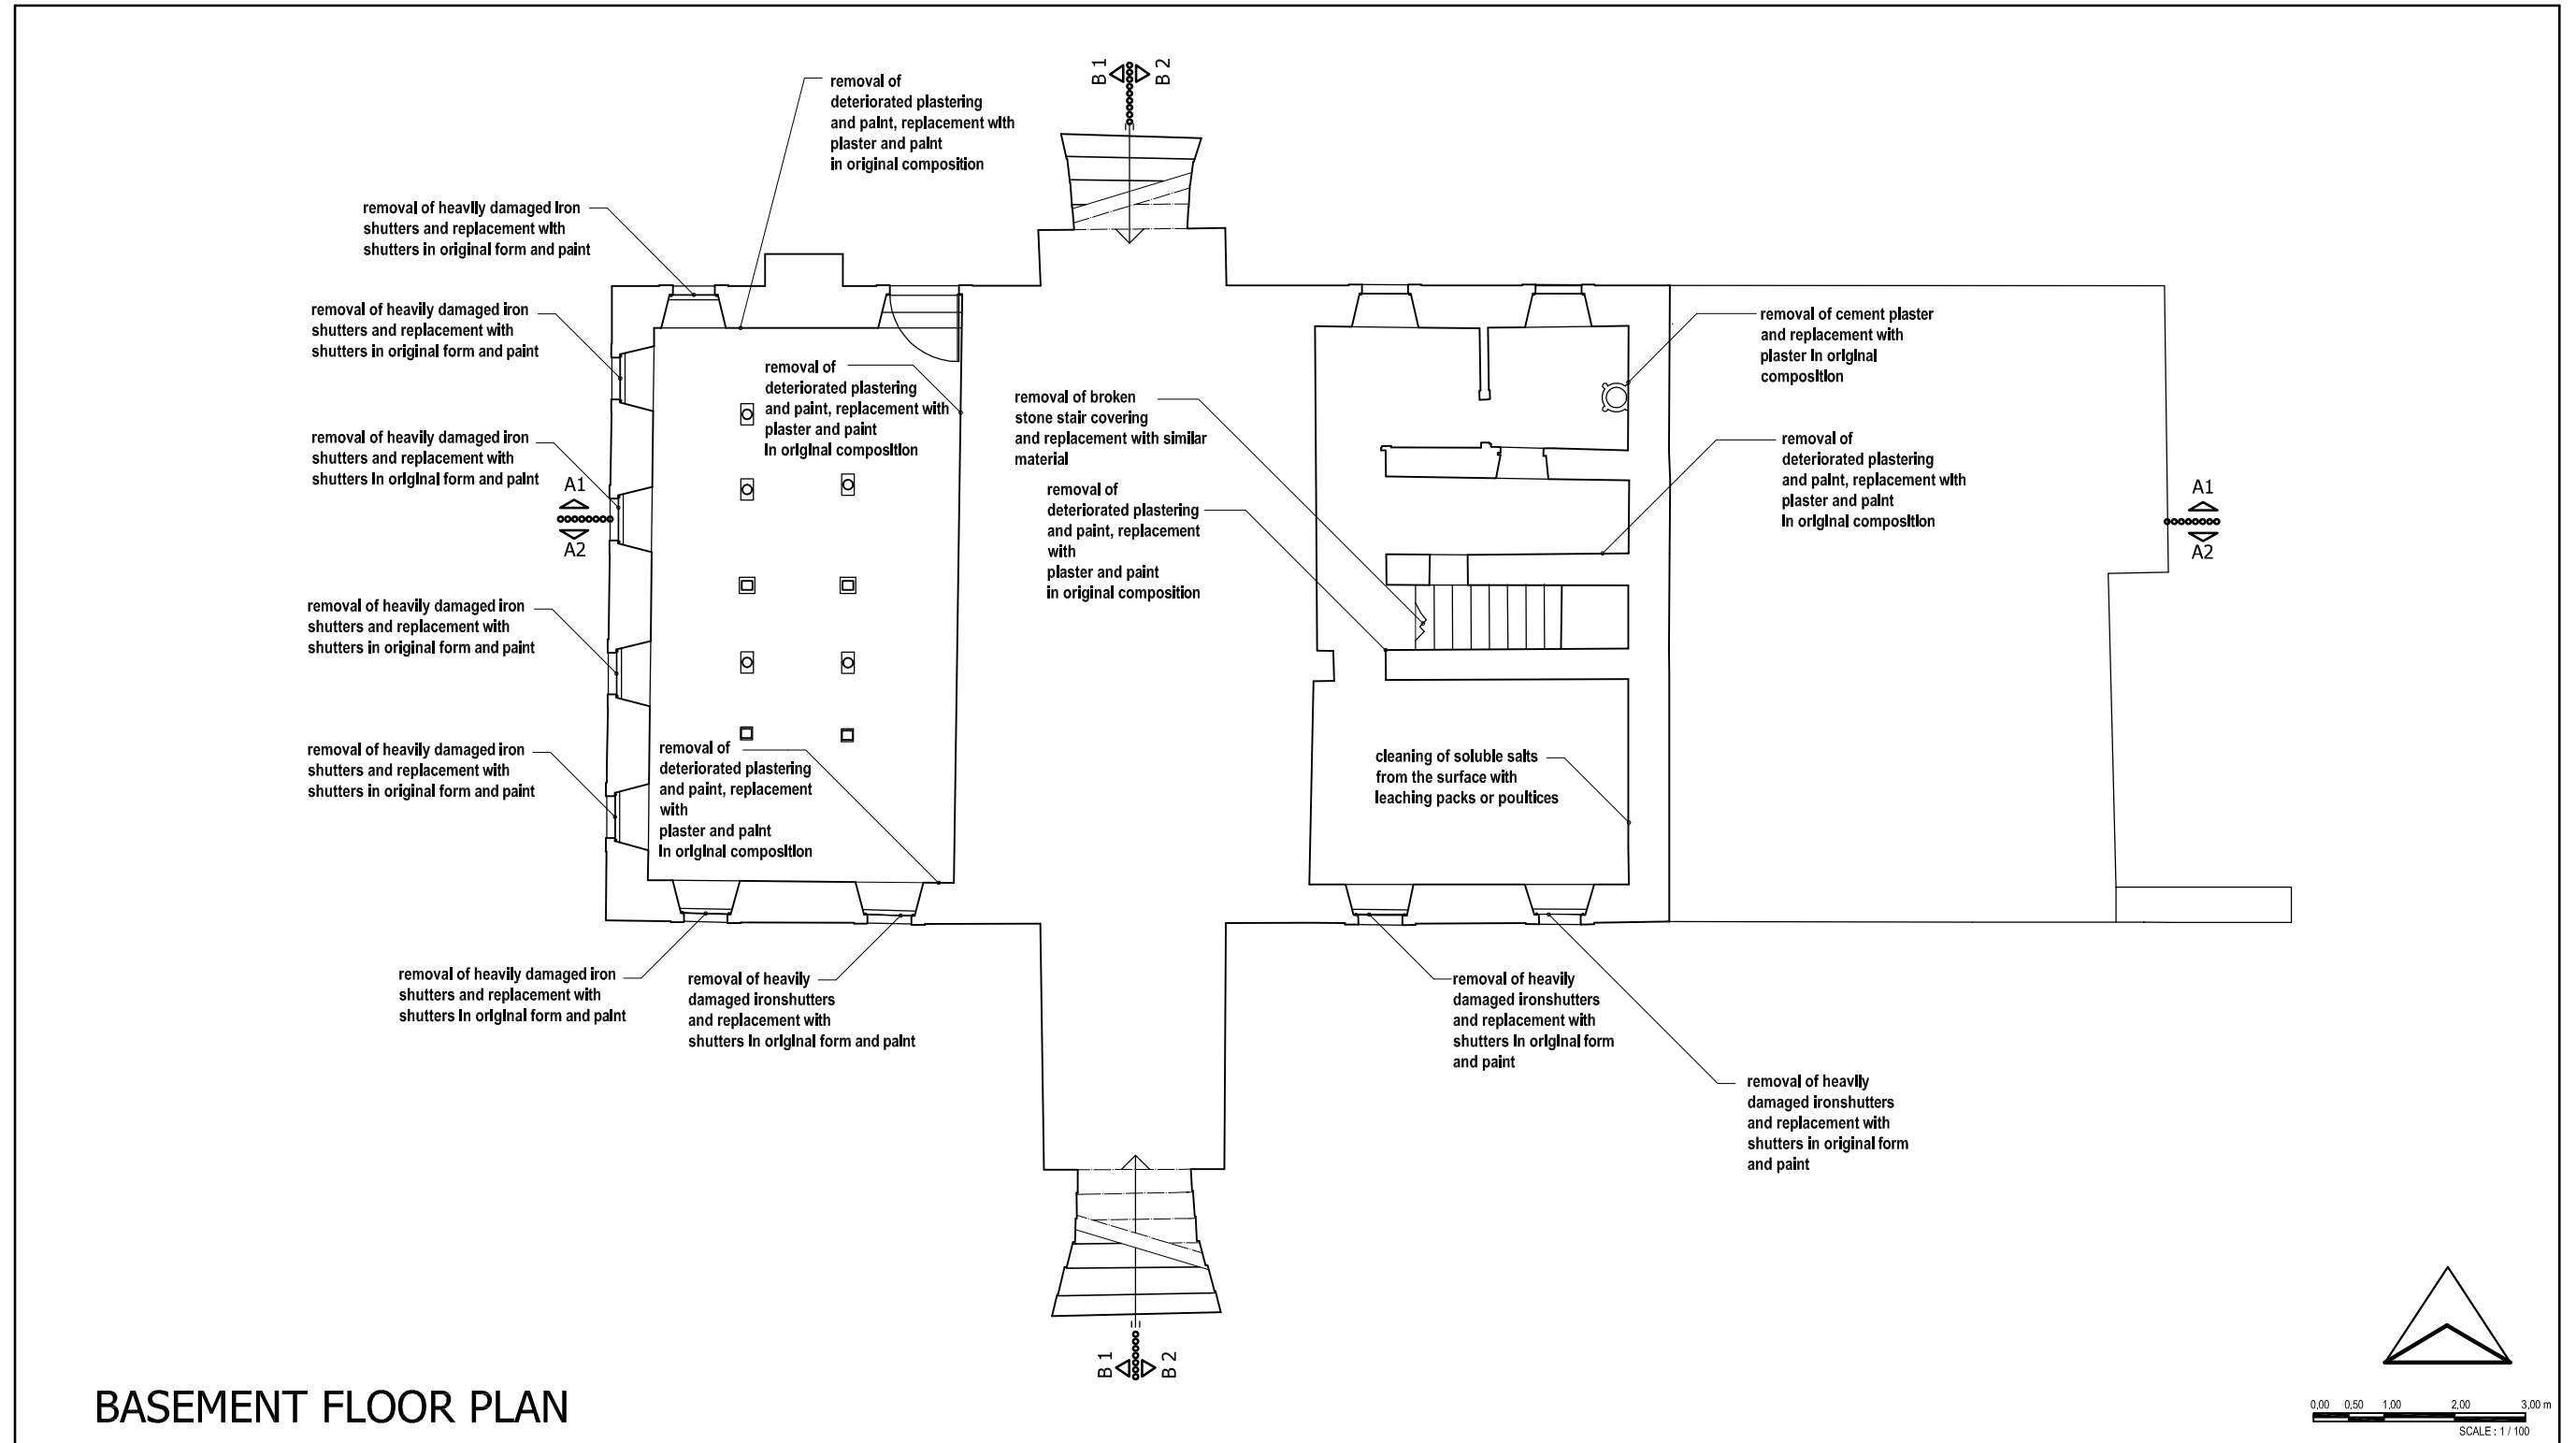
Remedial Measures for Structural Damage and Material Decay- Basement Floor Plan
